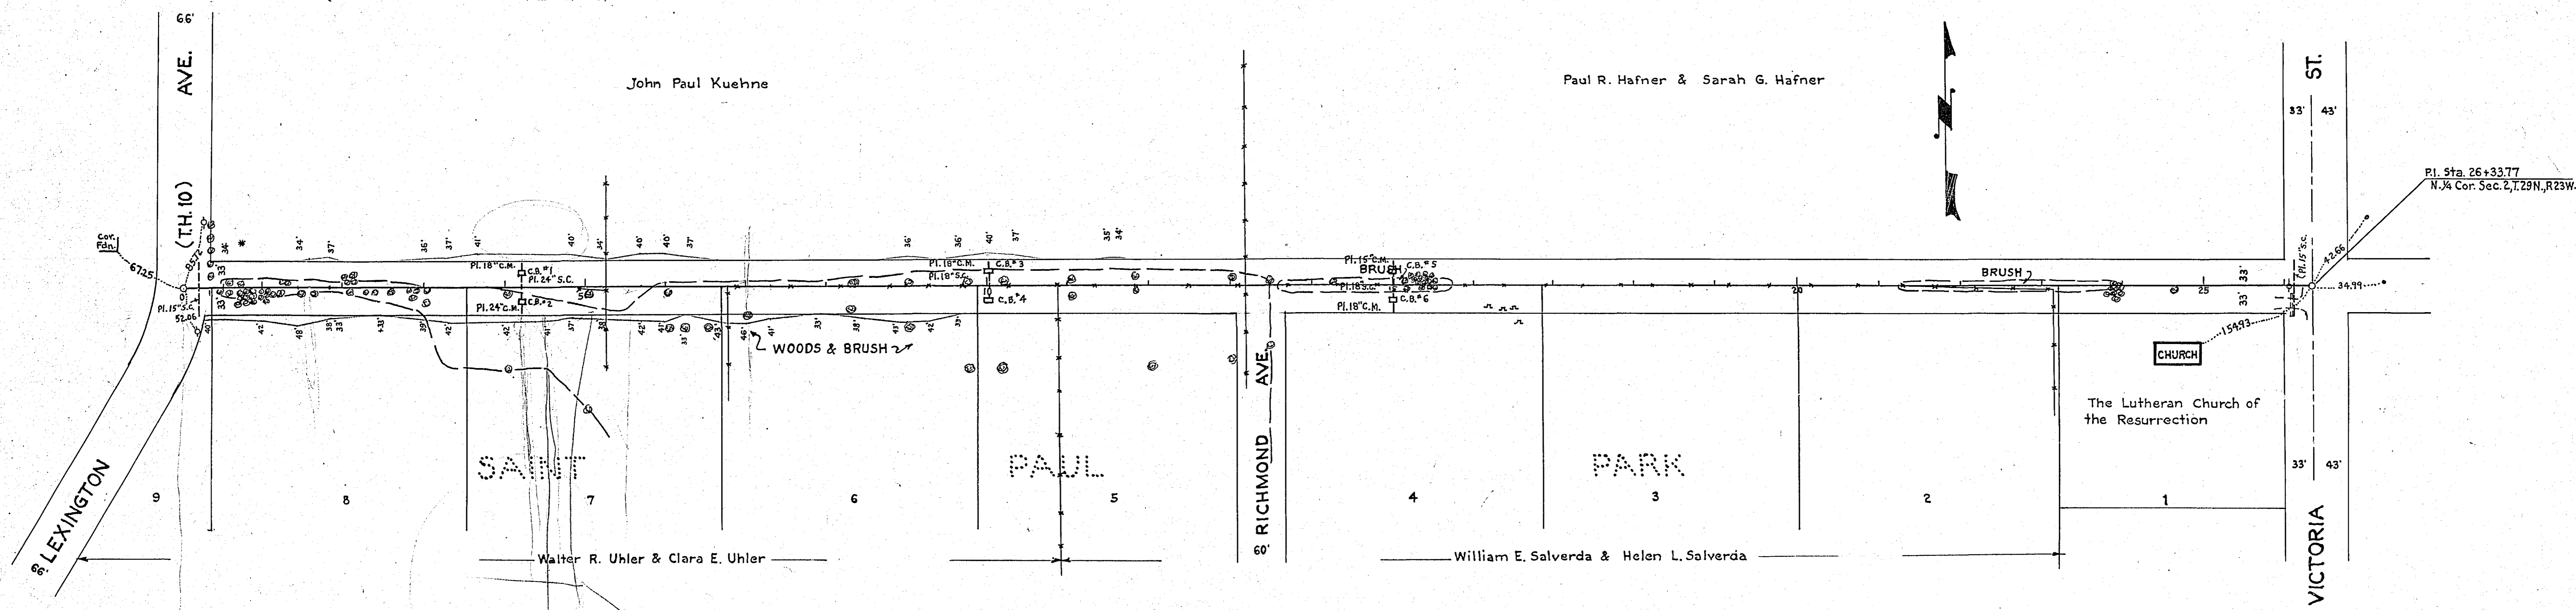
PLAN & PROFILE OF ROAD TO BE CONSTRUCTED
